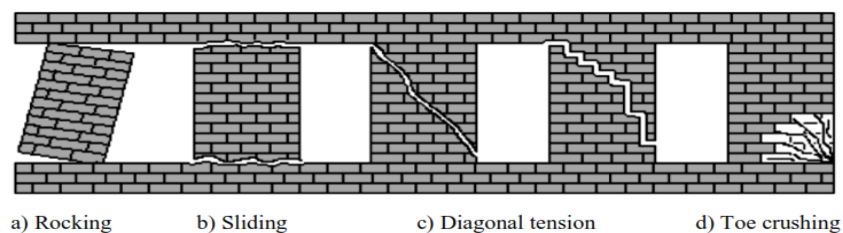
Masonry Wall Failure Modes Under In-Plane Loading
